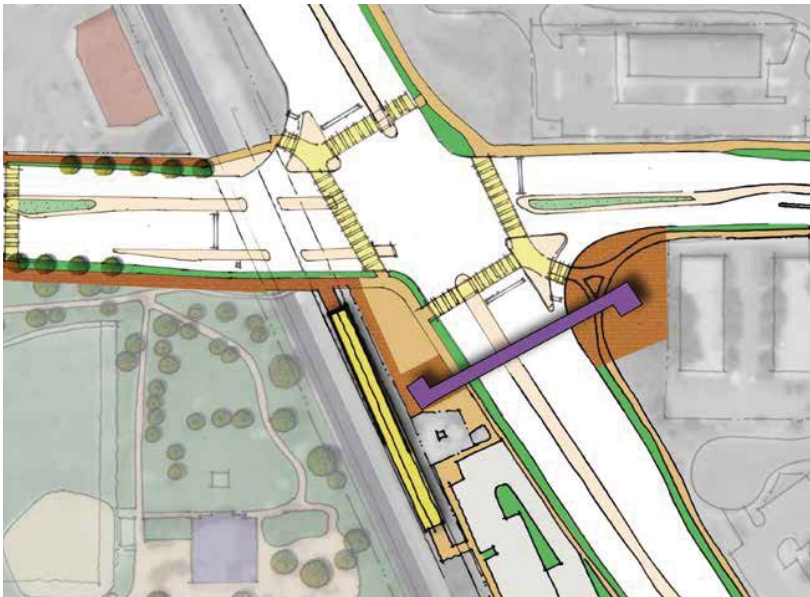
PLAN OF CONCEPT PEDESTRIAN BRIDGE
